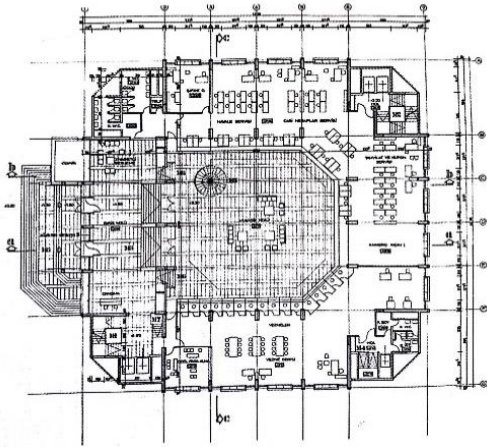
Izmir Central Bank Ground Floor Plan [20]
